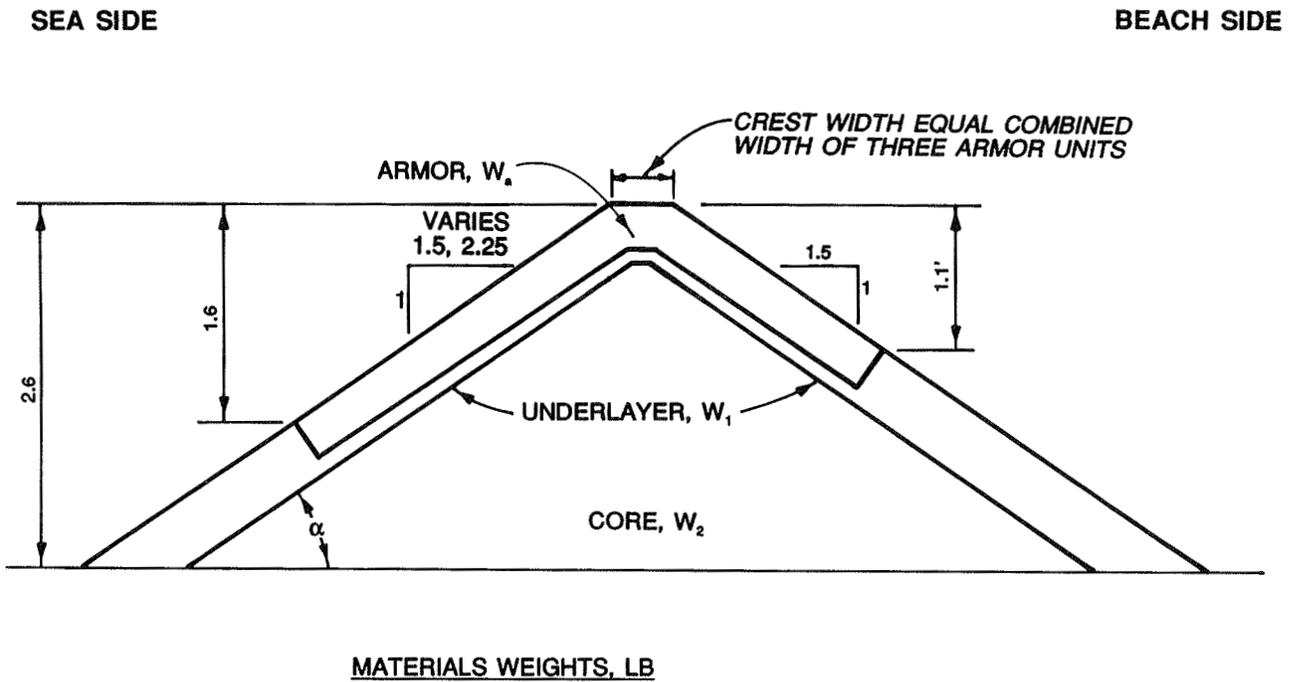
Typical breakwater cross section, depth = 2.0 ft
